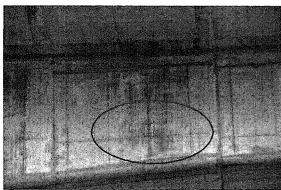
Cracks in Rama 3 (Web of main girder)
